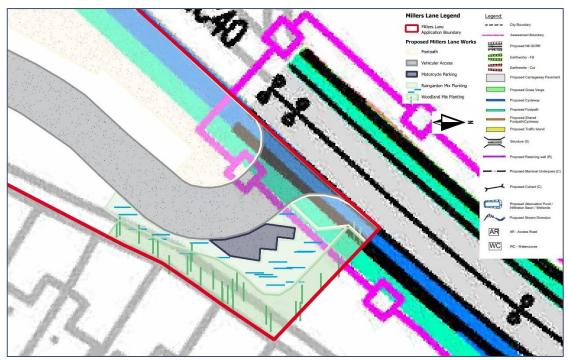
Details of the proposed works under this application relating to the new site access, overlaid on and extract of the Project Layout Plan (Drawing No: Figure 5.1.13) from the N6 GCRR application response to further information (2025)
